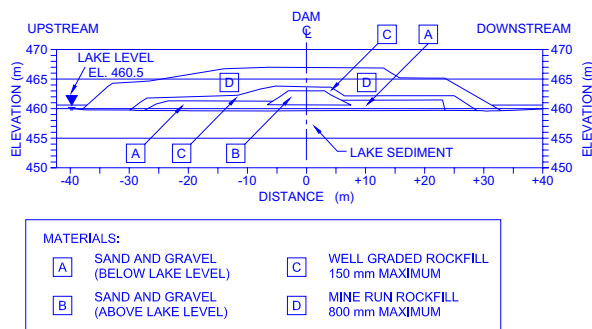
Dam Cross Section, Station 0+193, Panda Diversion Dam
